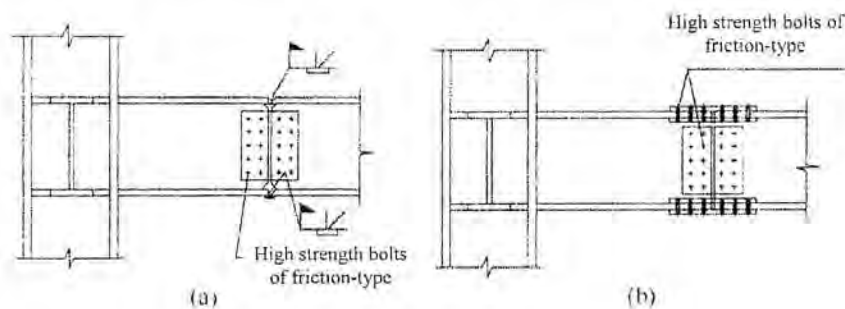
Connection of Frame Column and Cantilever Section of Beam
